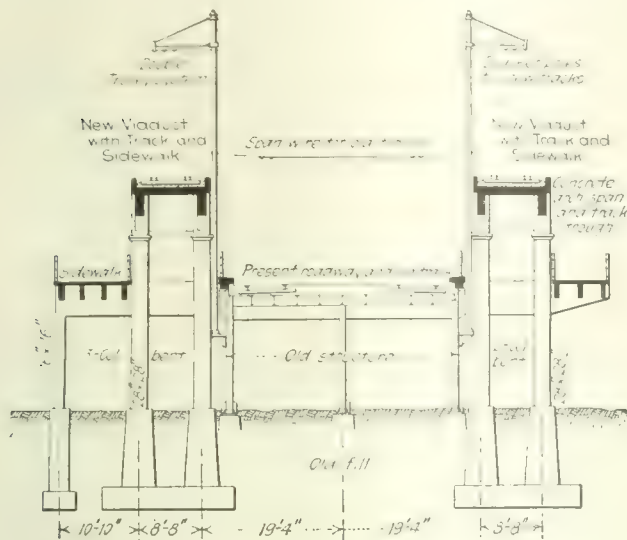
CROSS-SECTIONS OF CONCRETE VIADUCT
